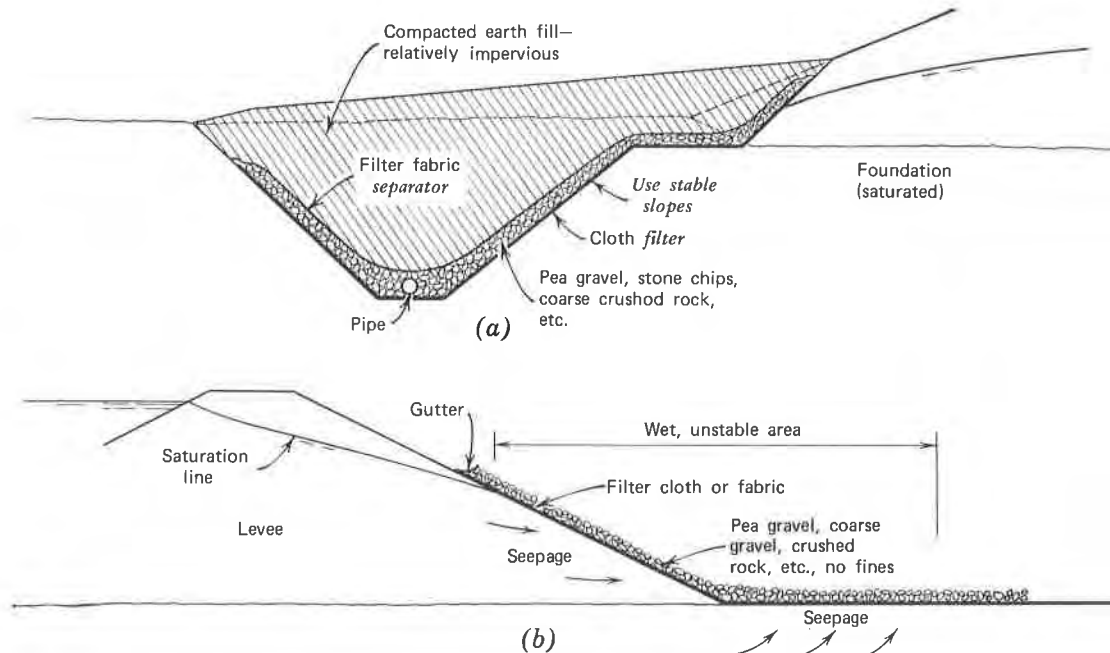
Illustration of two potential uses for fabrics in drains for dams and levees. (a) A toe drain controlling seepage through dam and foundation, (b) A temporary measure for preventing imminent failure. (After Fig. 5.16 of "Seepage, Drainage, and Flow Nets," 2nd Ed., H. R. Cedergren, Copyright © 1977, John Wiley & Sons, Inc. N. Y. Reprinted by permission of John Wiley & Sons, Inc.)
